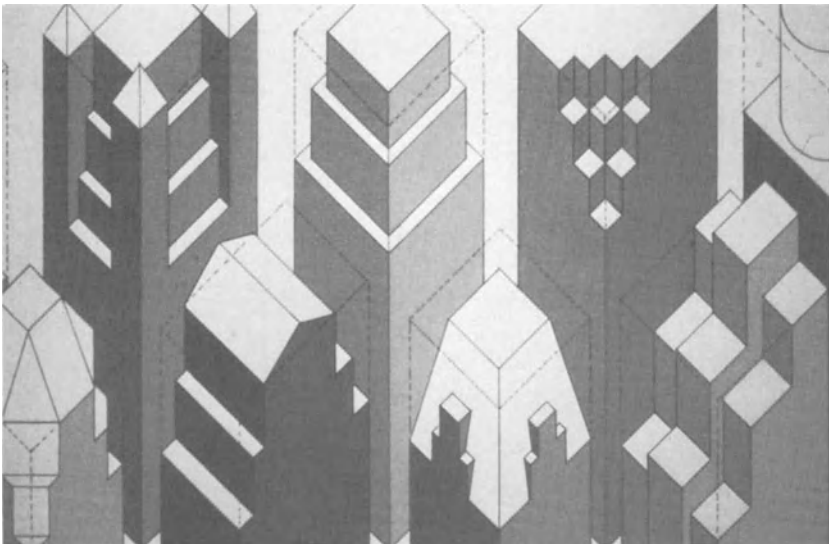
Schematic diagrams of examples of building forms permitted under the Downtown Plan
